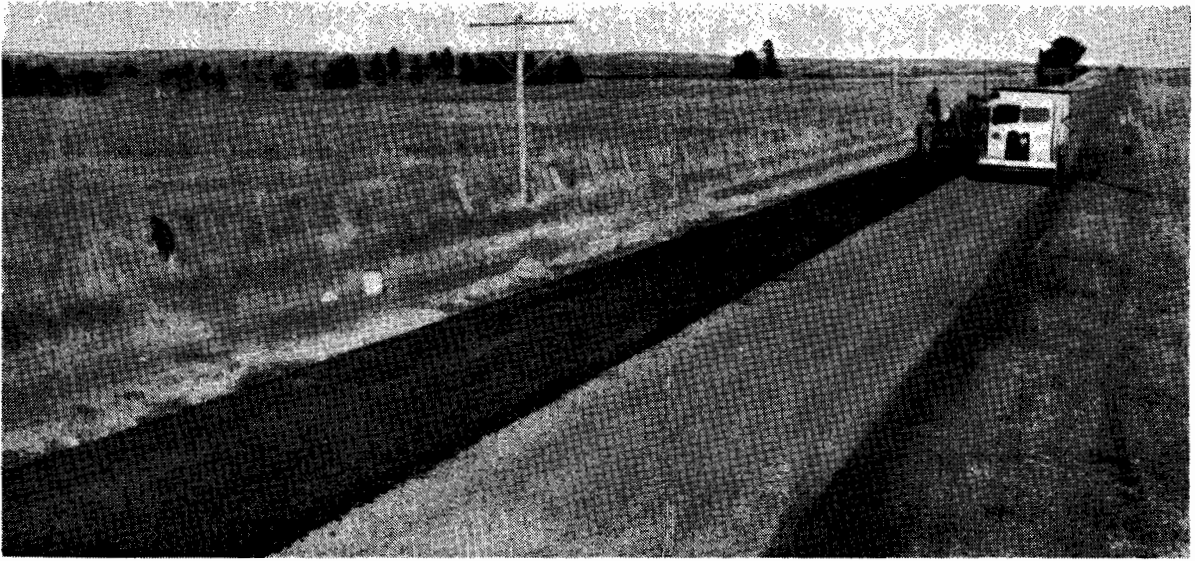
Hot-mix seal on Winchelsea-Dean's Marsh Road.
